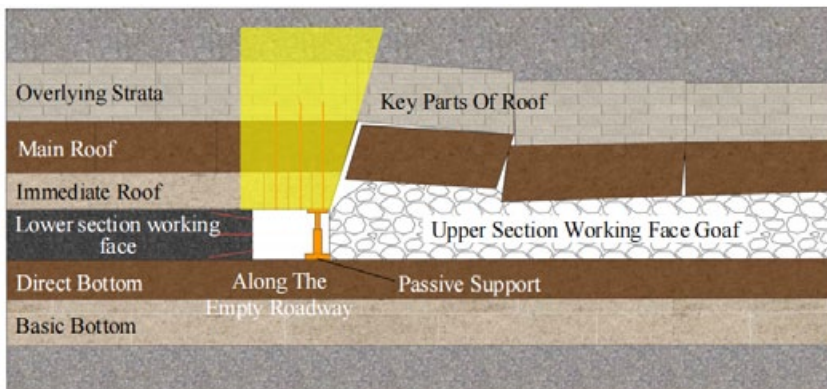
Structural illustration of ‘short cantilever’ beam at key position of roof
